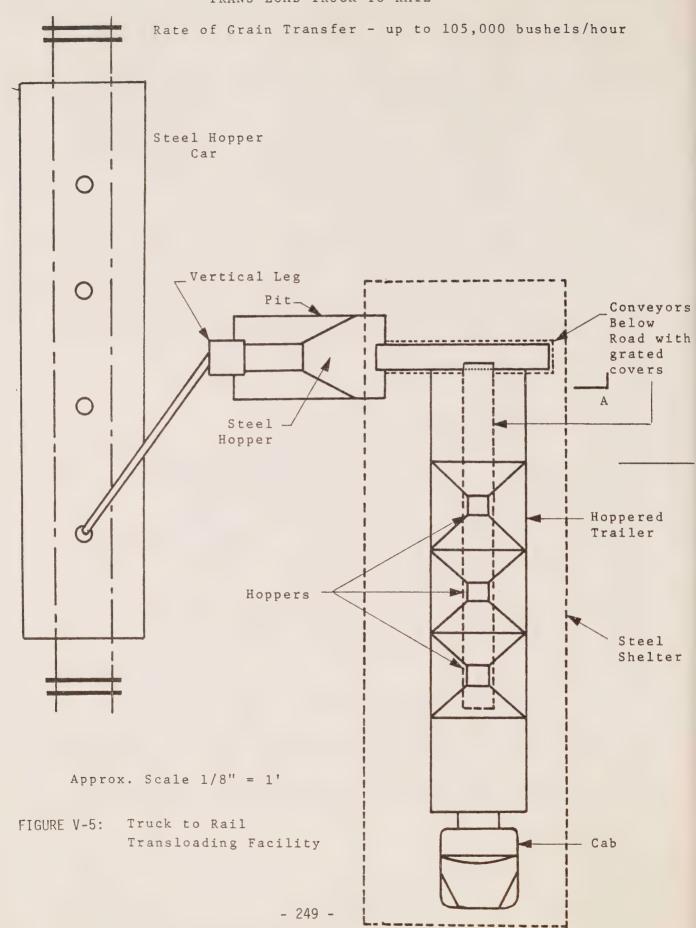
is a plan view of the truck-to-rail transloading facility. A cross-sectional view is shown in Figure V-6. Detailed cost estimates and design are summarized in Appendix F.
